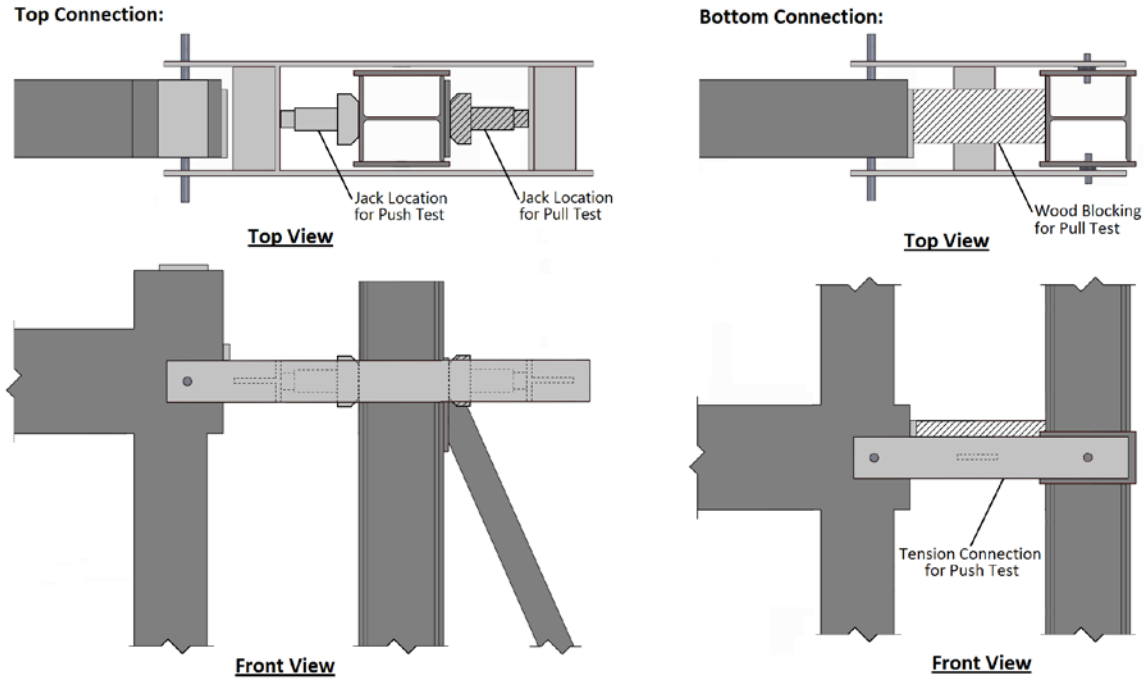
Concrete Frame to Steel Frame Connection and Jack Locations
